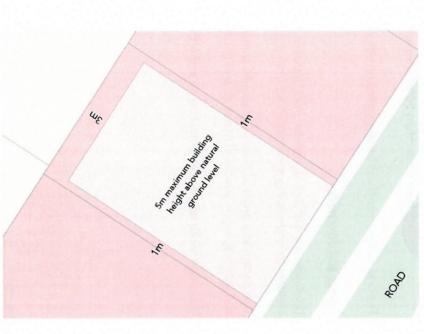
Conventional Residential Lots Building Envelope (Green Ridge)
